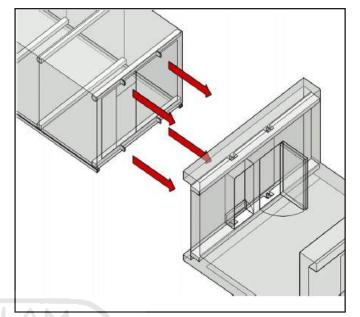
Access to rail stoppers installation points Source: Di Pasquale et al. (2020)
